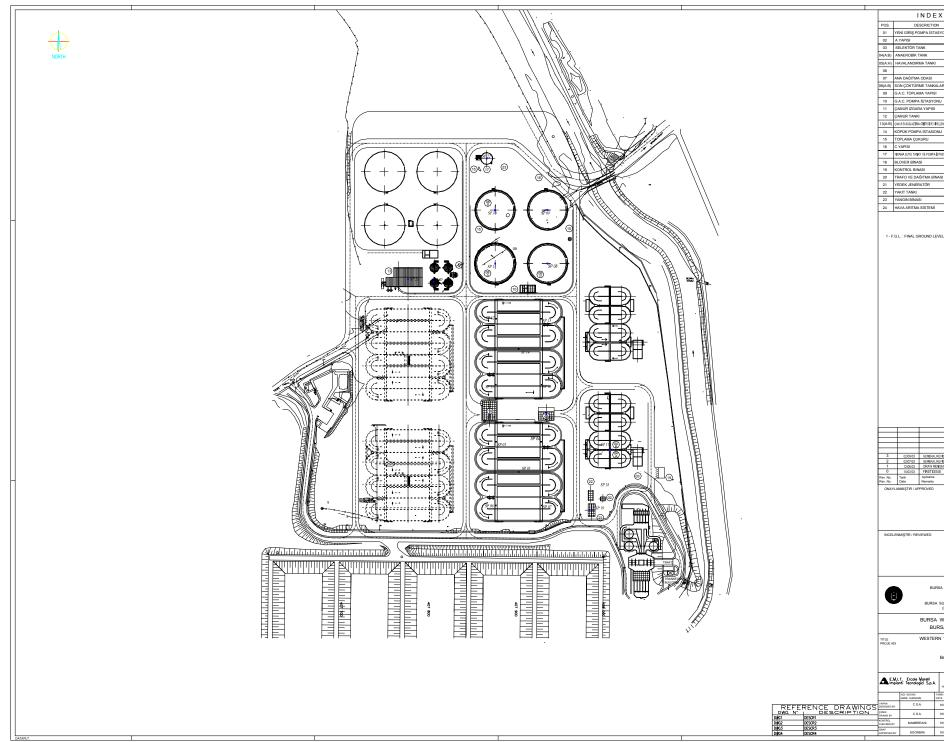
SP Layout of Bursa West Waste Water Treatment Plant Project
